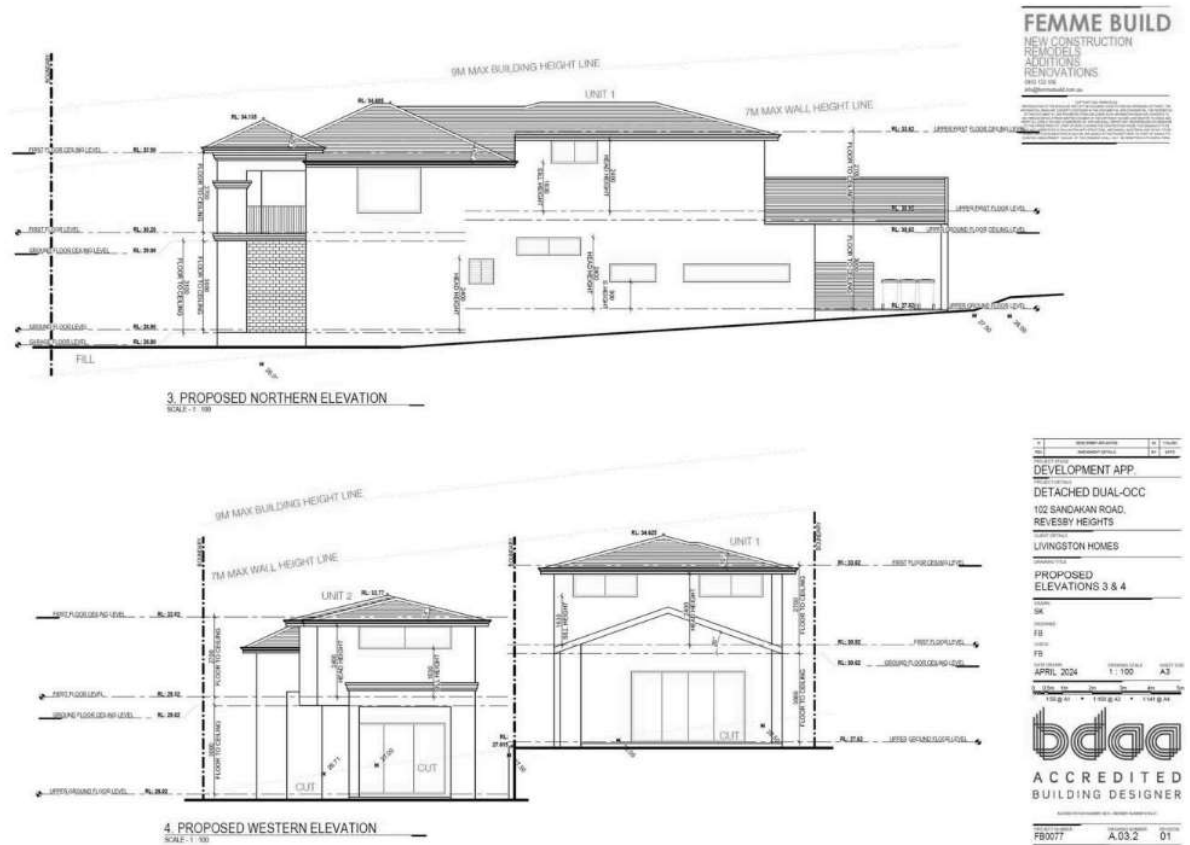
Proposed Northern & Western Elevation (Source: Femme Build)
